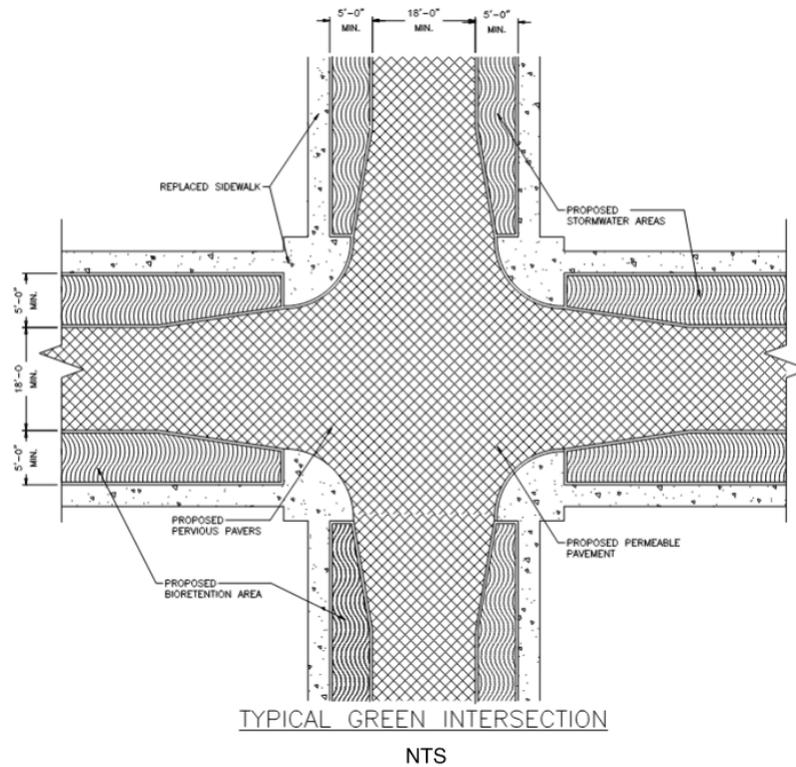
Schematic Plan View of Project Alternative No. 3 (Curb Extension & Permeable Pavement Intersections)
